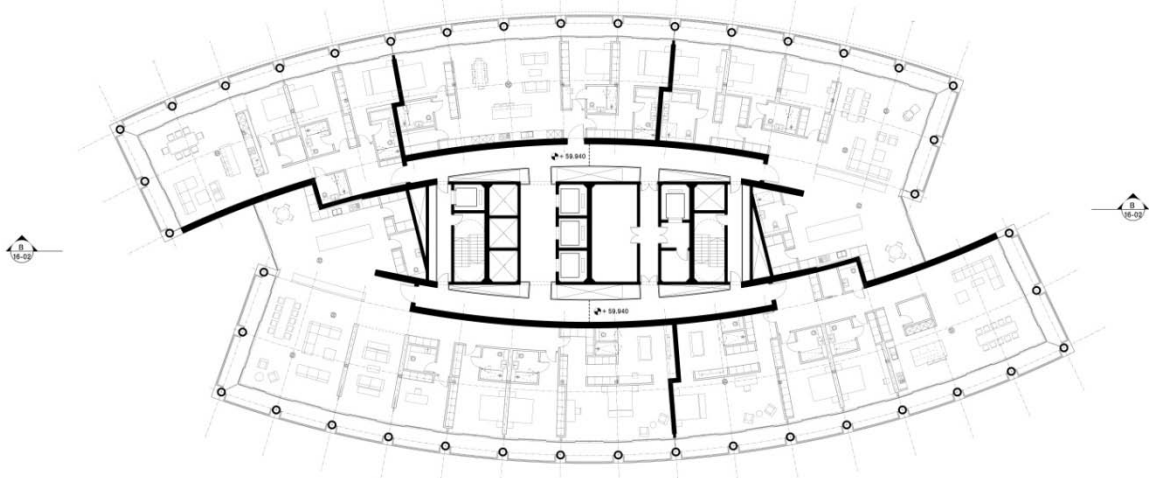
Portland House, Typical Floor Plan 1, Proposal (DCA, 2013)
